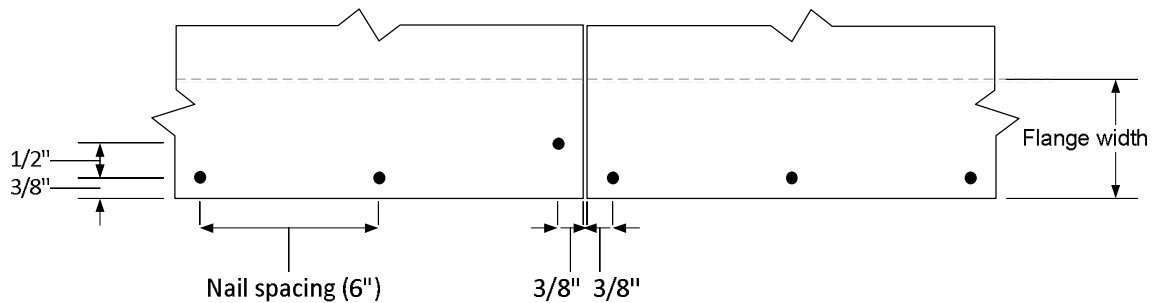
Boundary nails for nail spacing of 6 inches o.c. (not to scale)
